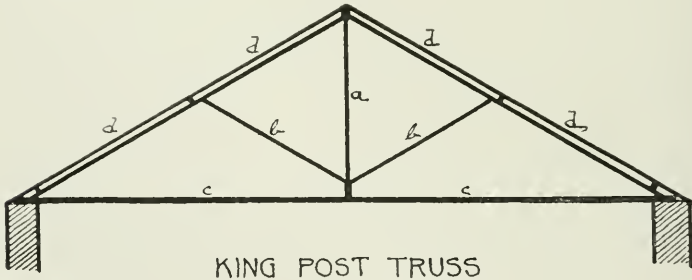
a*, King post. *b*, Struts. *c*, Tie beam. *d*, Rafters.
